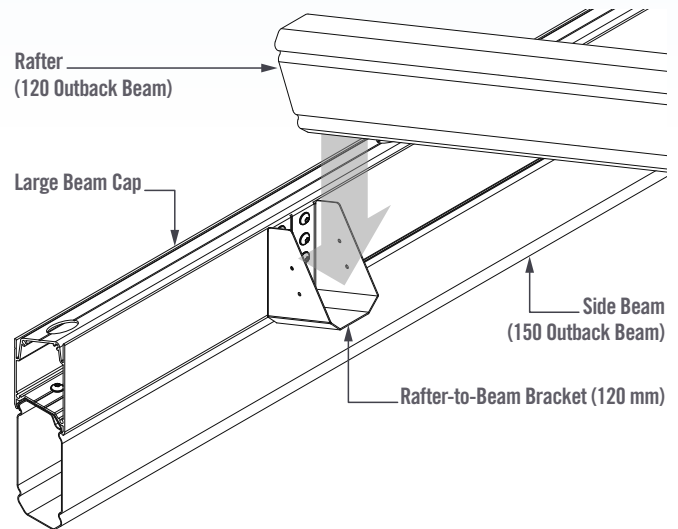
LARGE BEAM CAP - 150 SIDE BEAM - 120 RAFTER
